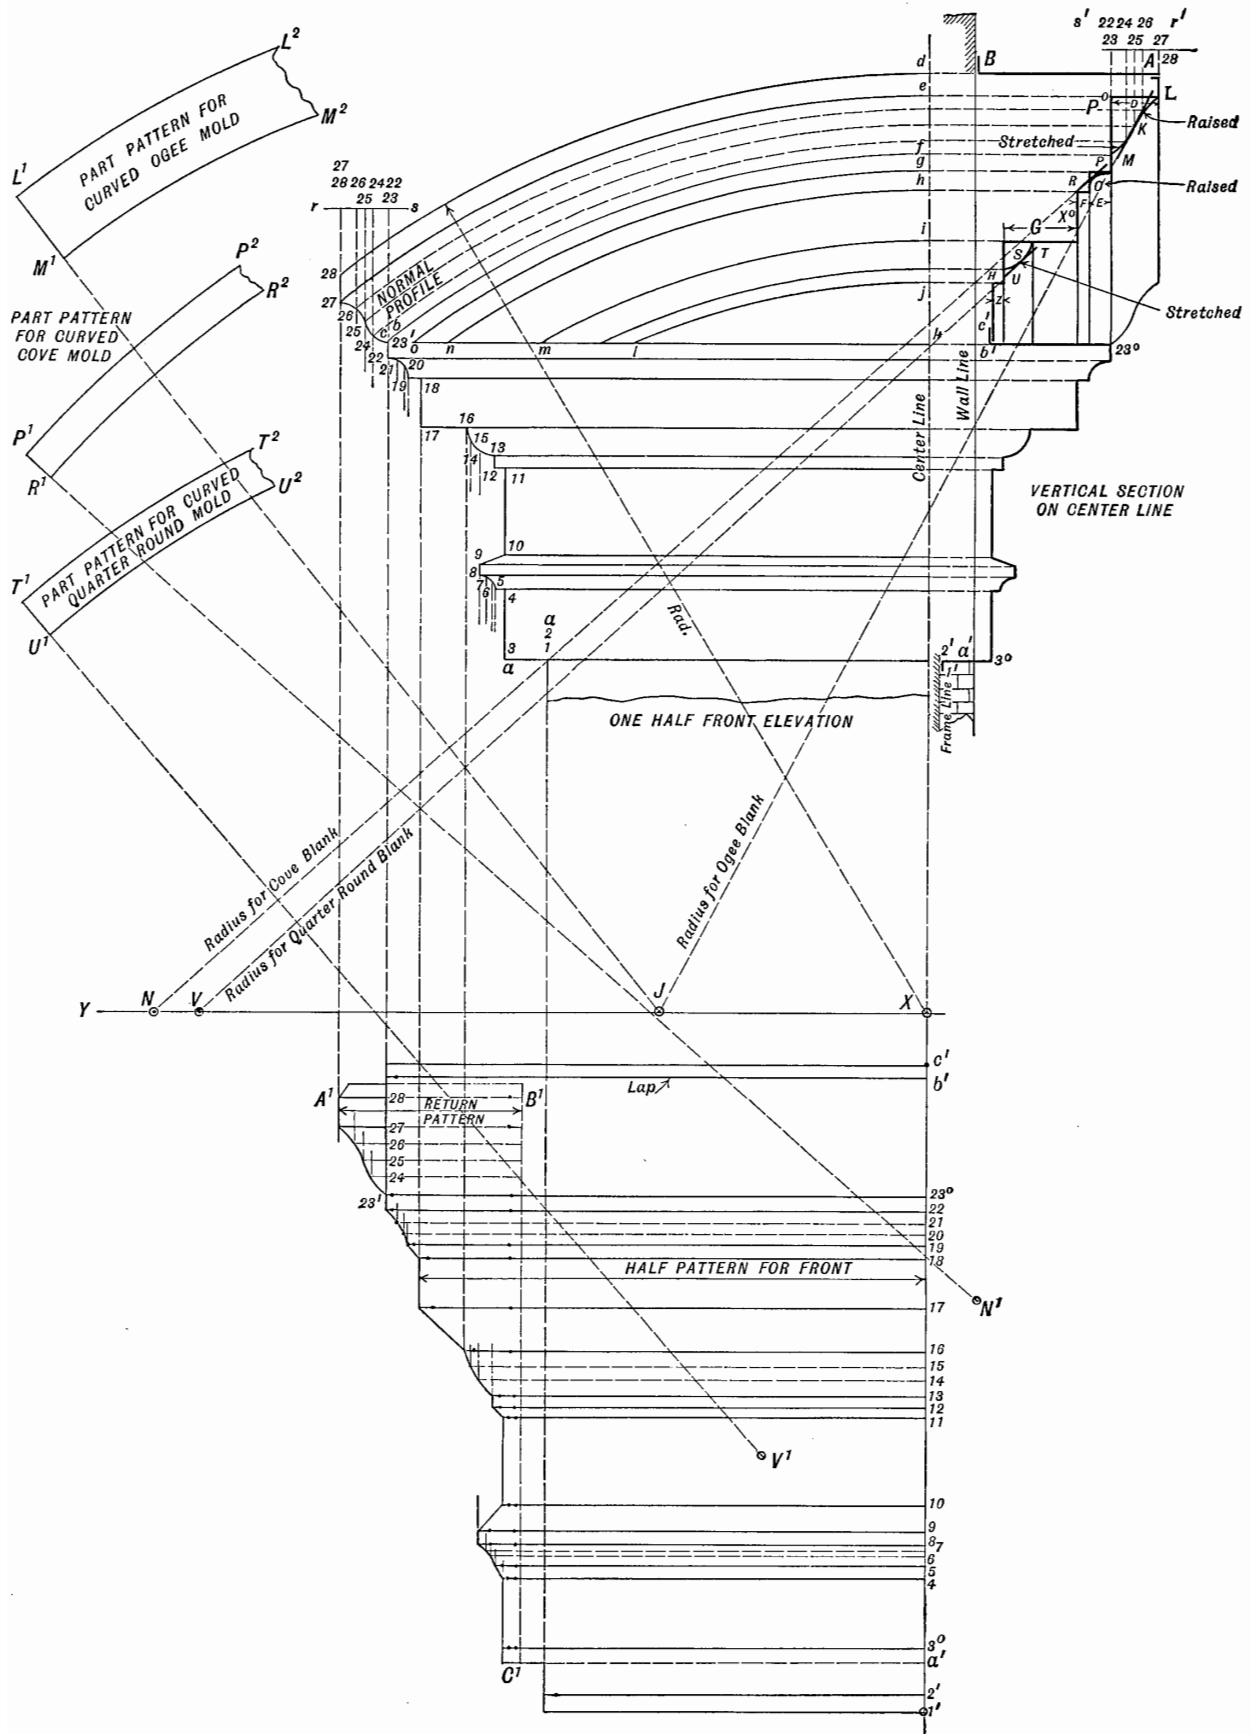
Working Drawing and Patterns for Segmental Pediment Made by Hand
